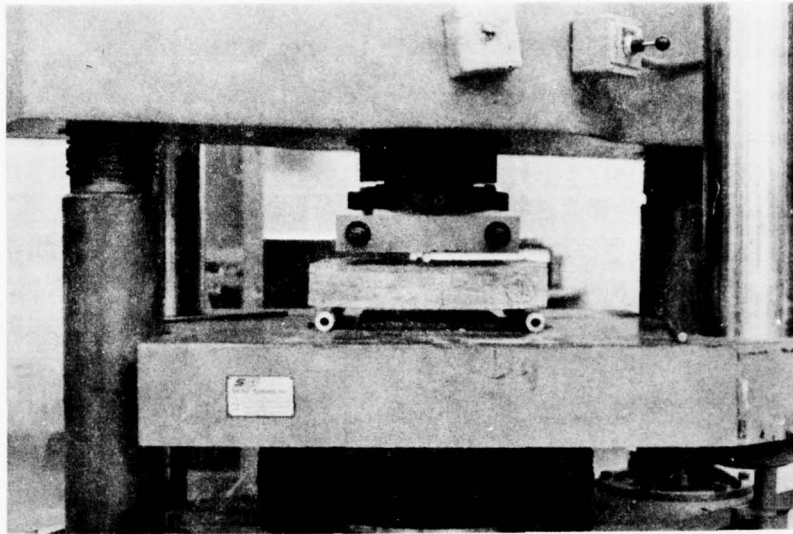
Satec Universal Testing Machine cracking a concrete slab in two.
